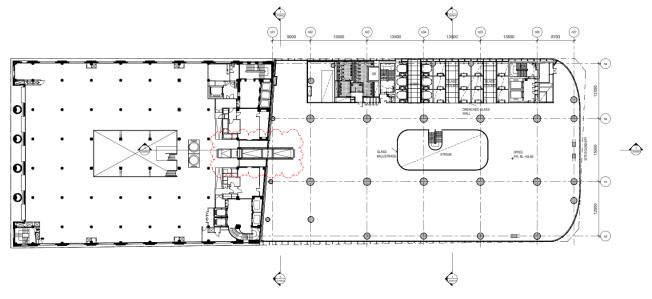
Proposed Level 7 Bridge Link - General Arrangement
